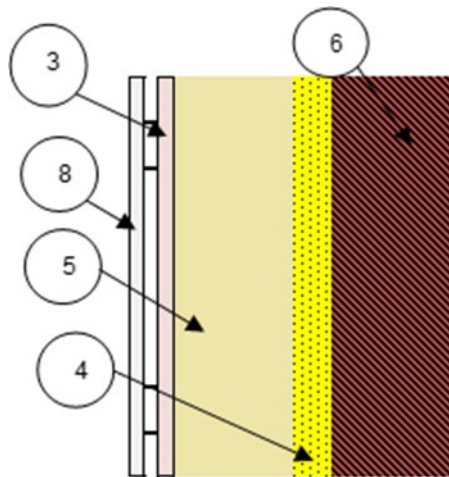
External brick wall (or equivalent) with massive timber wall system incorporating non-fire grade lining and cladding – Section view
